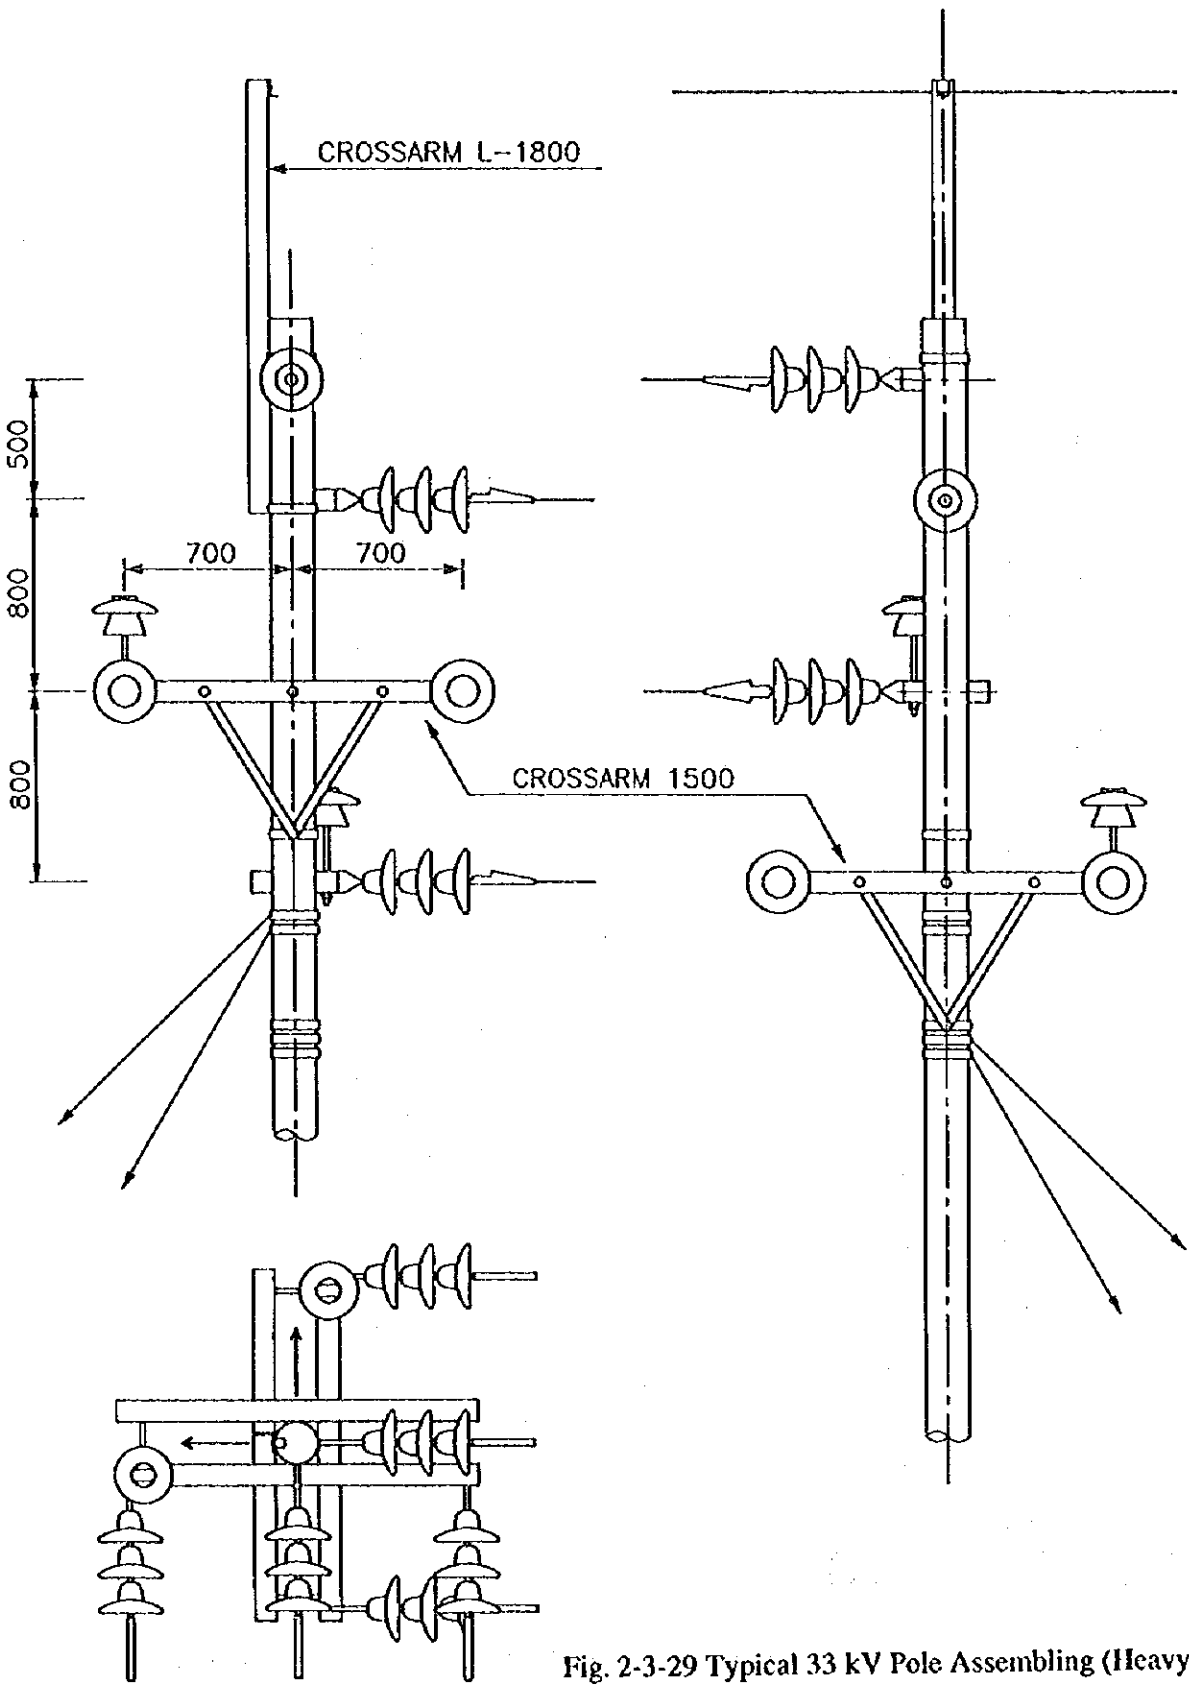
Typical 33 kV Pole Assembling (Heavy Angle)
